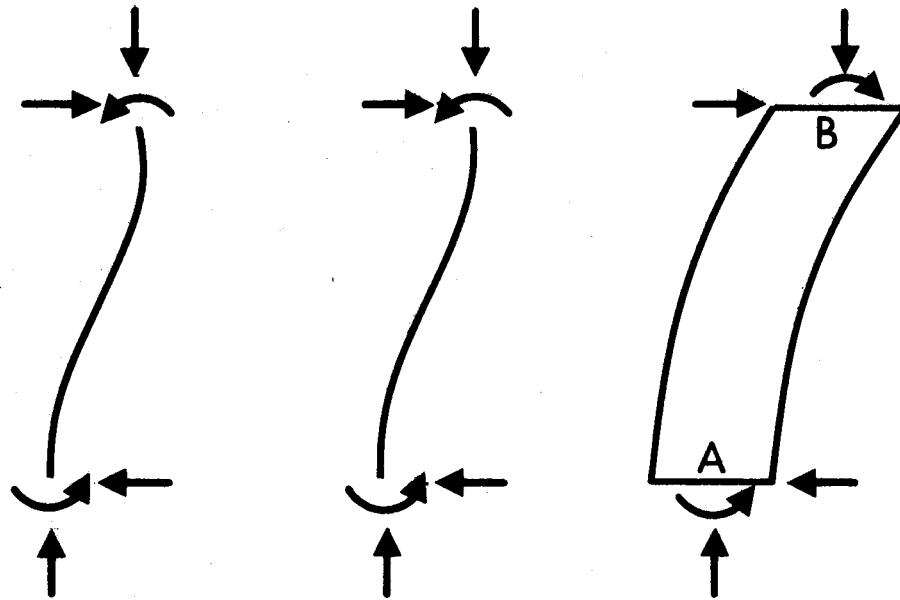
FORCES ACTING ON COLUMNS AND SHEAR WALL
